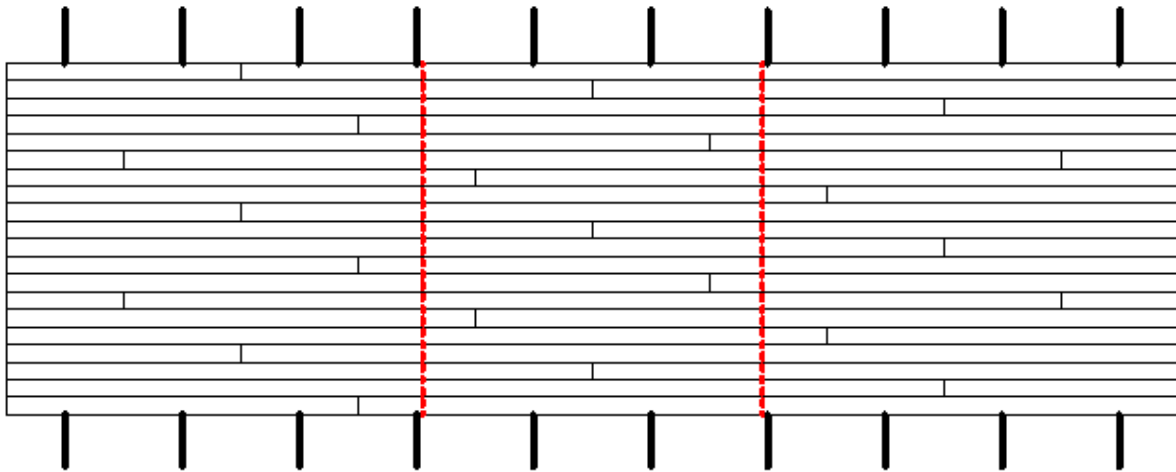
Deck with a butt joint pattern of 1 in 8. This means that there is one butt joint in every eight adjacent lamination.
